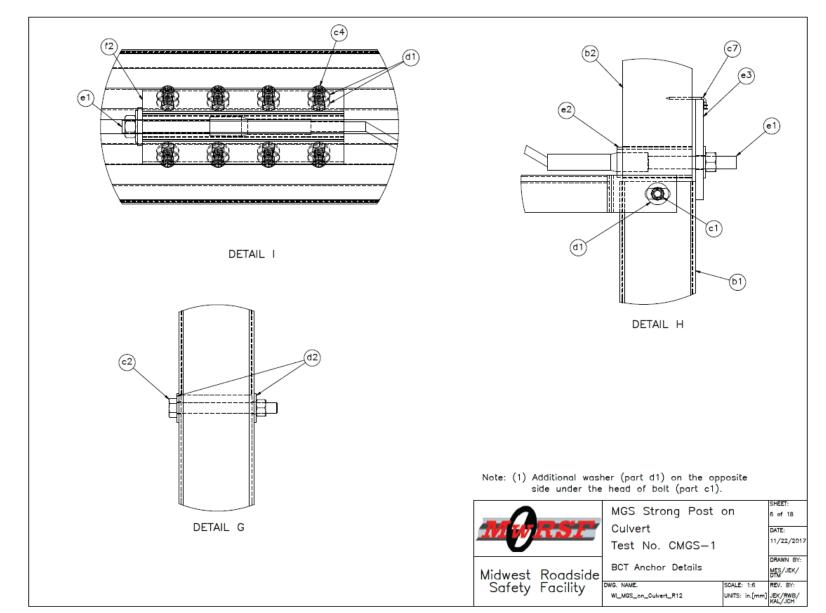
BCT Anchor Details, Test Nos. CMGS-1 and CMGS-2
